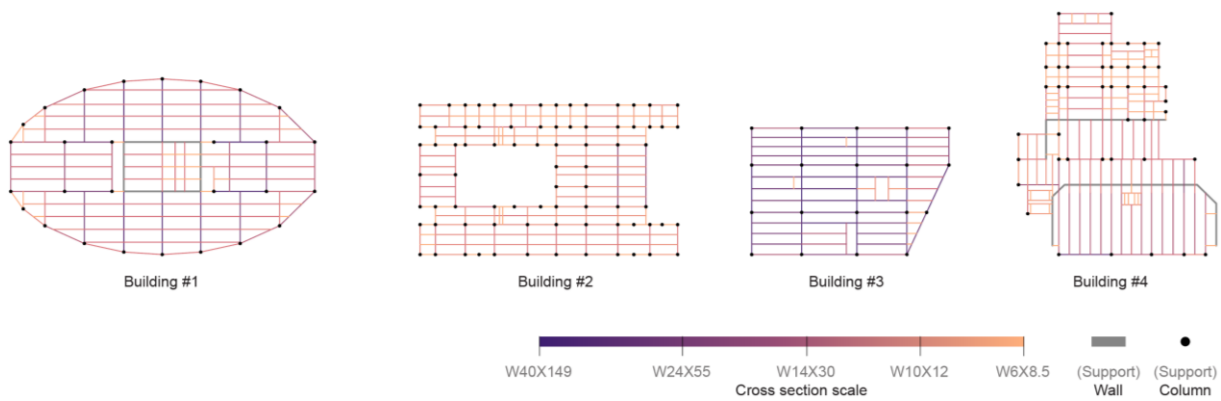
Steel framing plans of initial case study dataset Building# 1-4.
